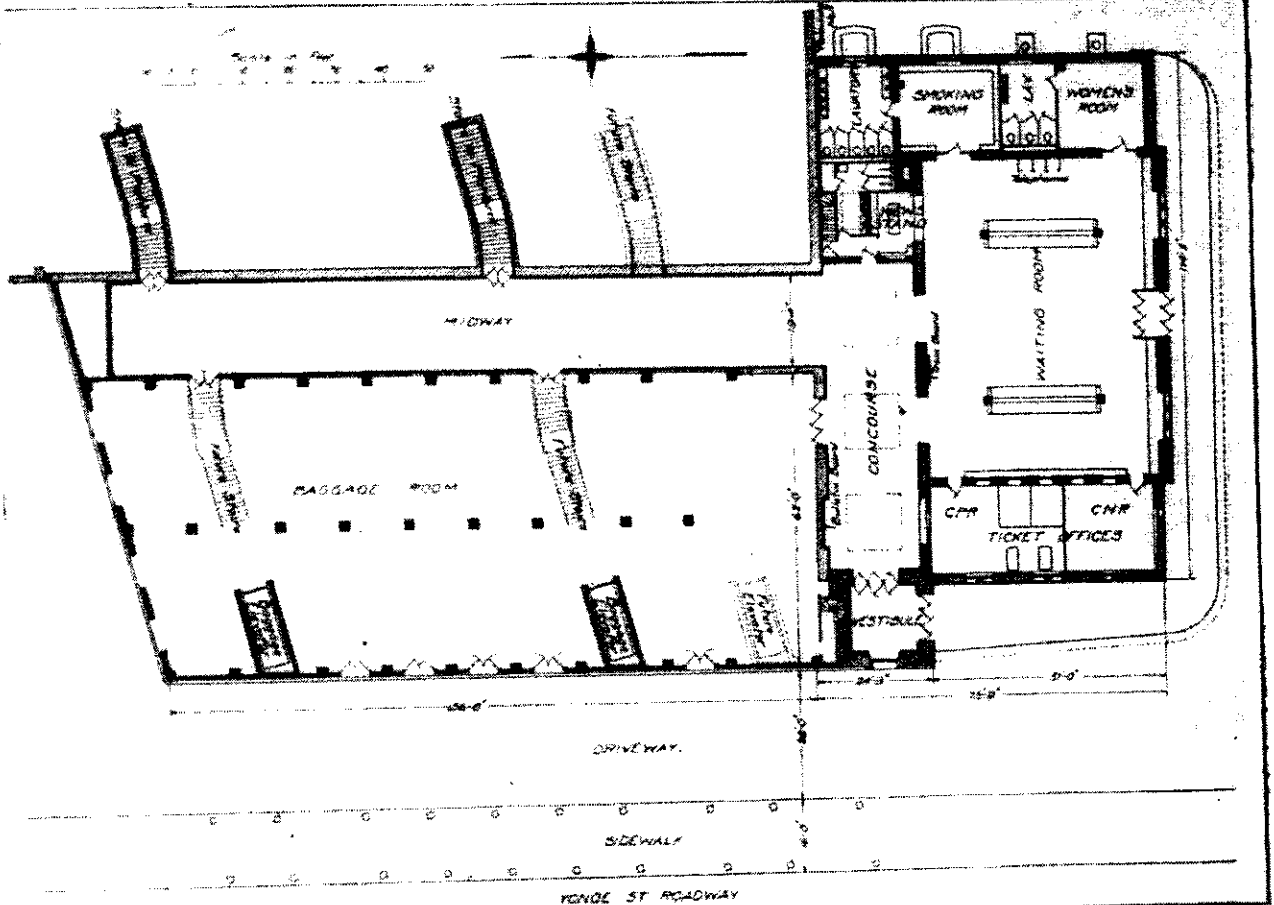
Ground Floor Plan of New North Toronto Station.
